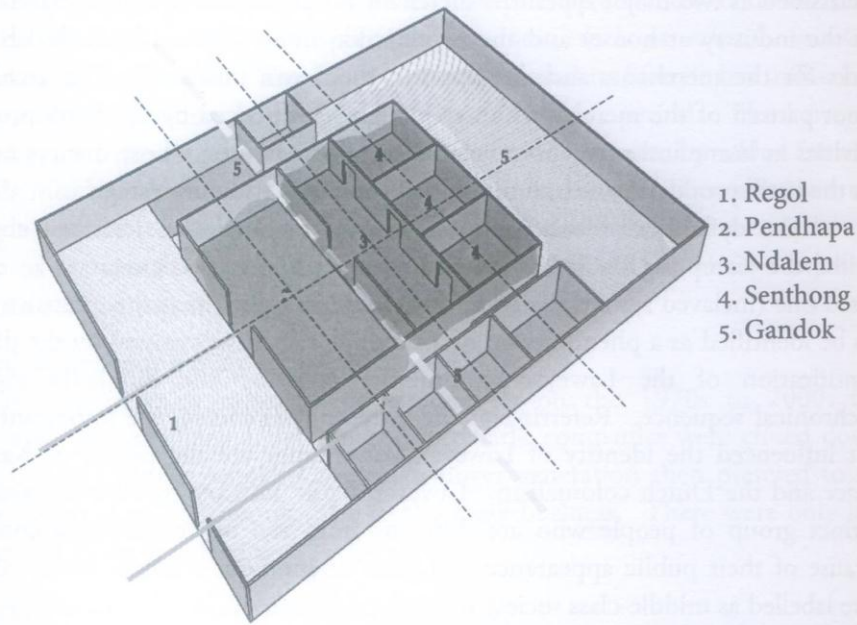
General plan of Laweyan residential building (Source: Priyatmono, 2004)
